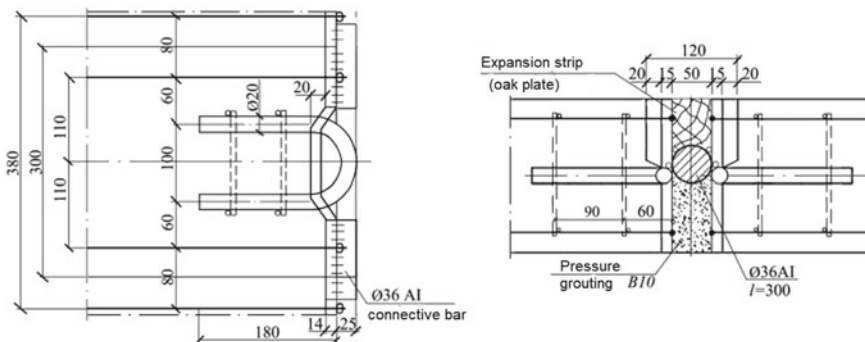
Butt joint design of the precast reinforced concrete slabs
